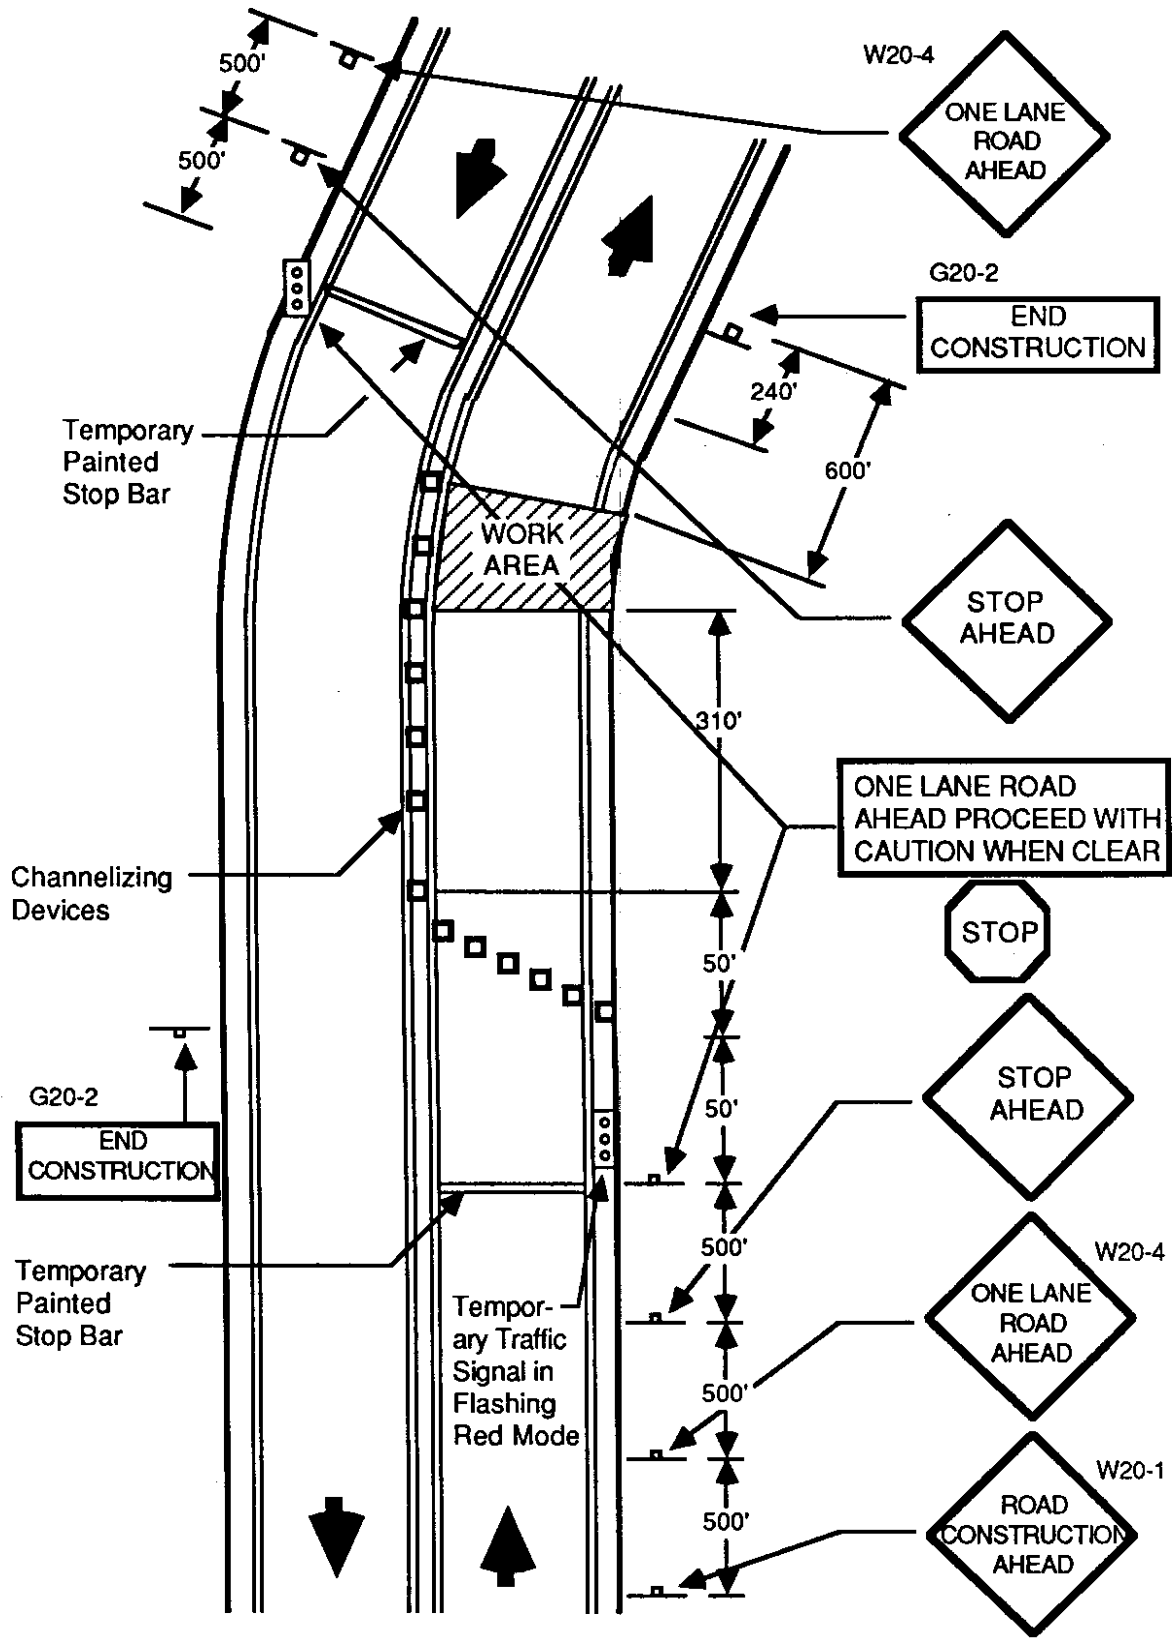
Traffic Control Plan Used for Stop Sign Controlled Two-Lane Highway Work Zone
